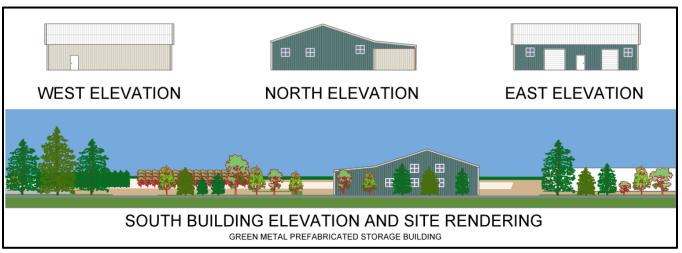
Pole Barn Elevations (Tool Storage Building and Existing Utility Building)
